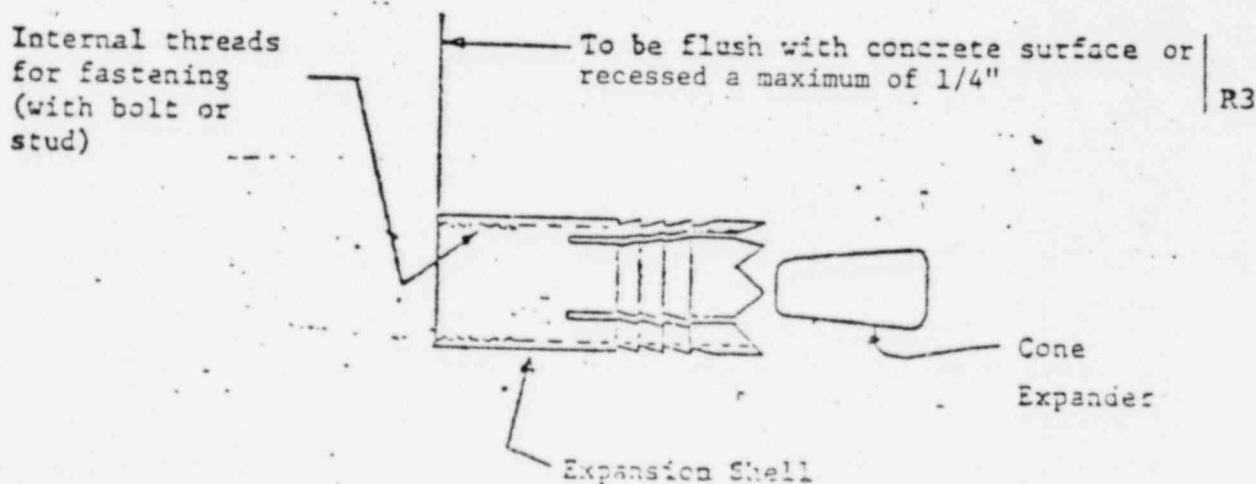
Typical Self-Drilling Type Expansion Anchor
